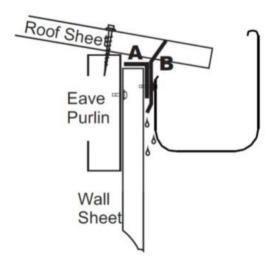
Ember-proofing technique for wall/roof boundary at guttering edges
